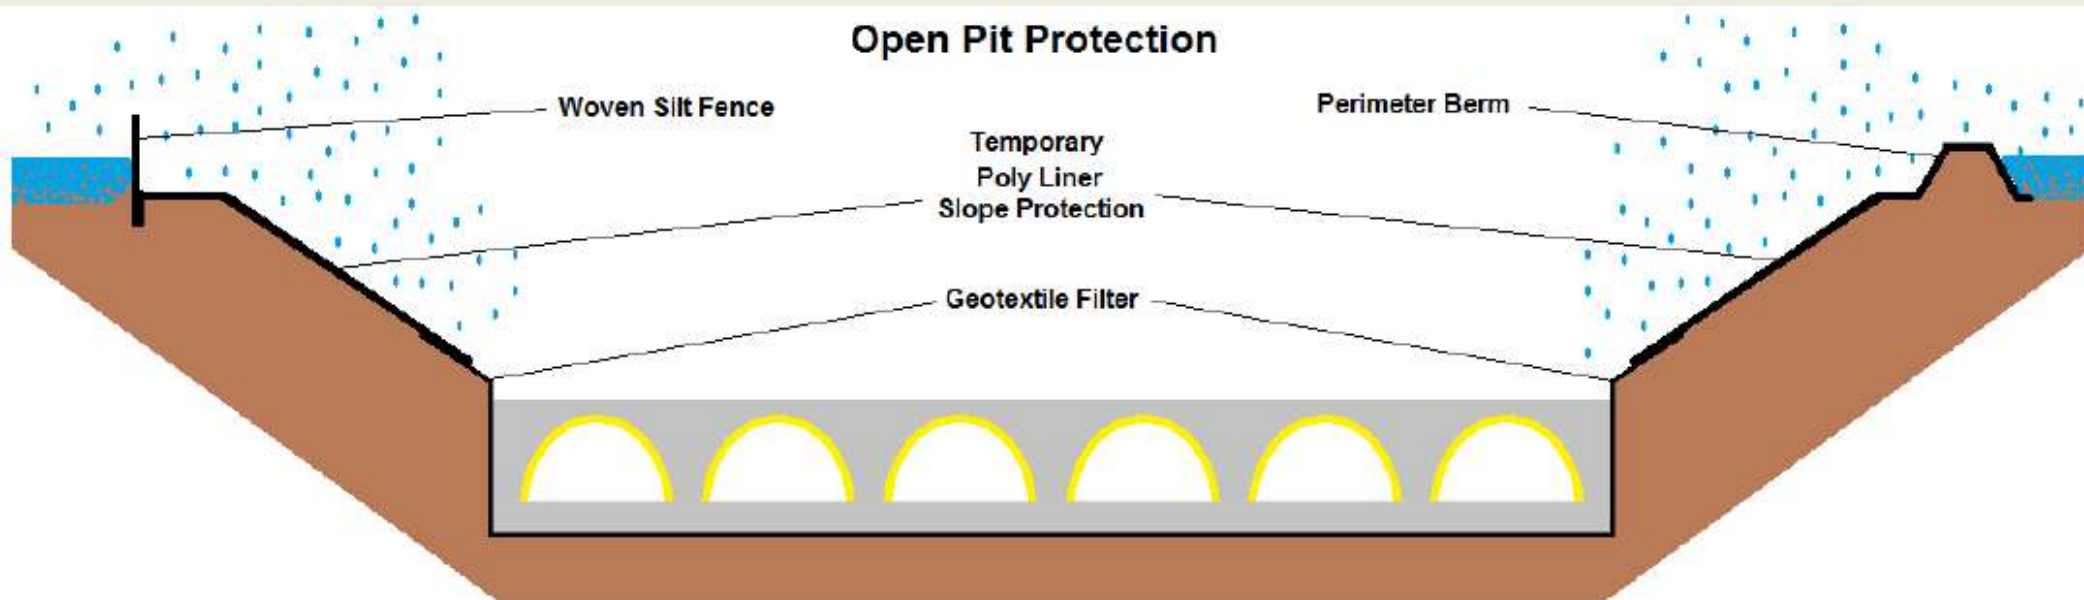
Examples of BMPs used to protect against contaminated runoff.
